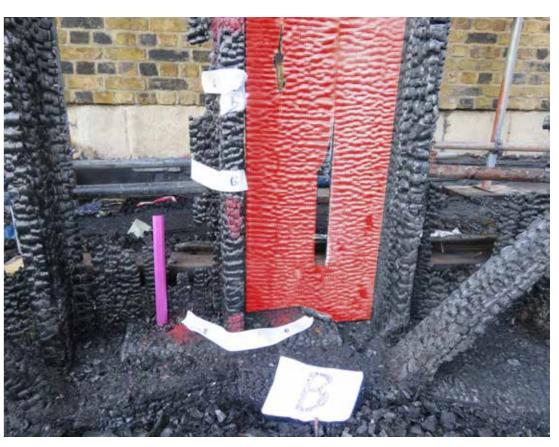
Wall boarding (H) in situ (interior view) (2020) © SLHA
